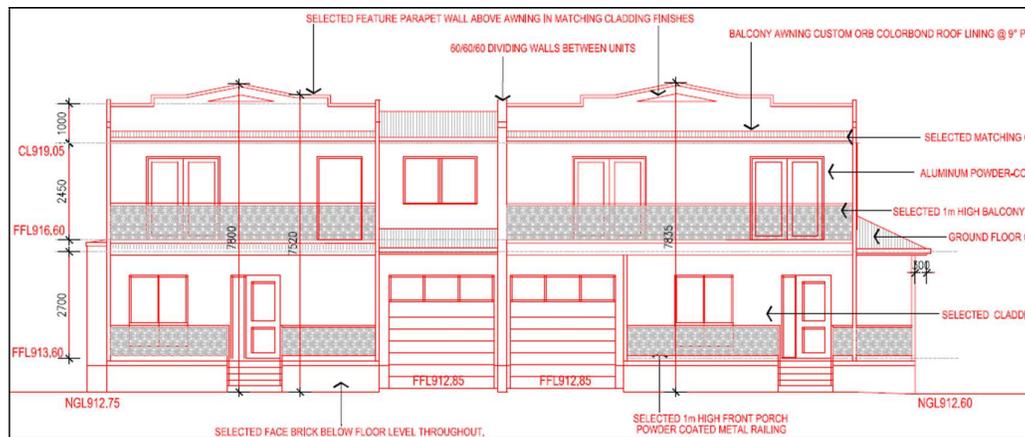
Proposed Front Elevation to Martini Parade (applicant)
